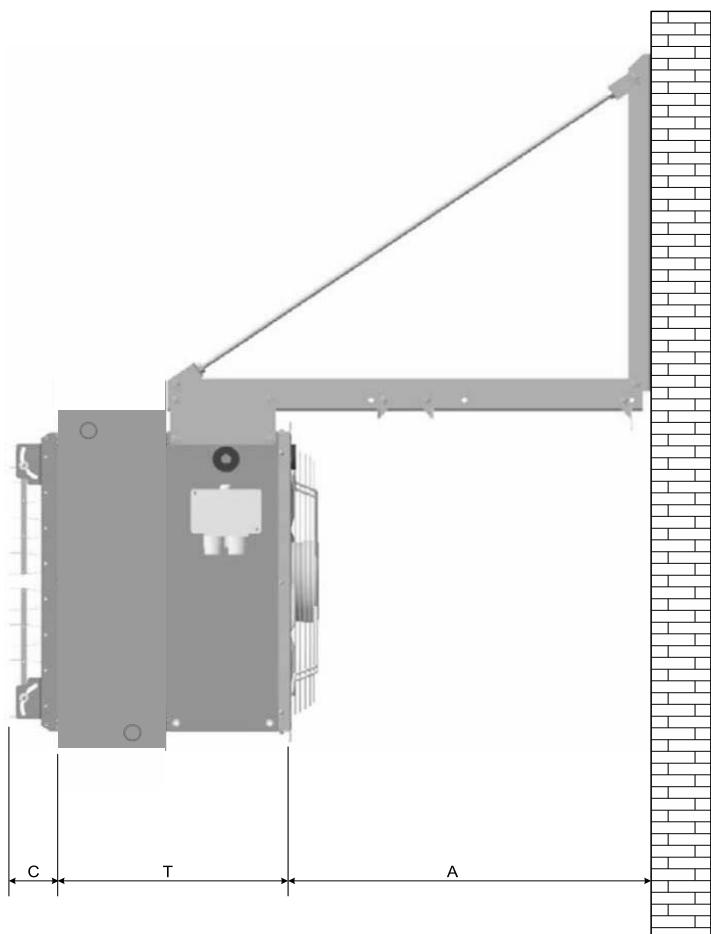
Example for suspension and assembly with heat exchanger casing industry
